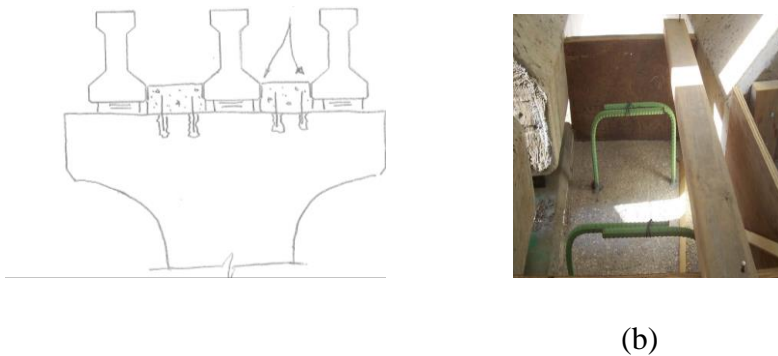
26: Stiffening bearing pads using shear keys: (a) Typical cross-section; and (b) Constructed shear keys
